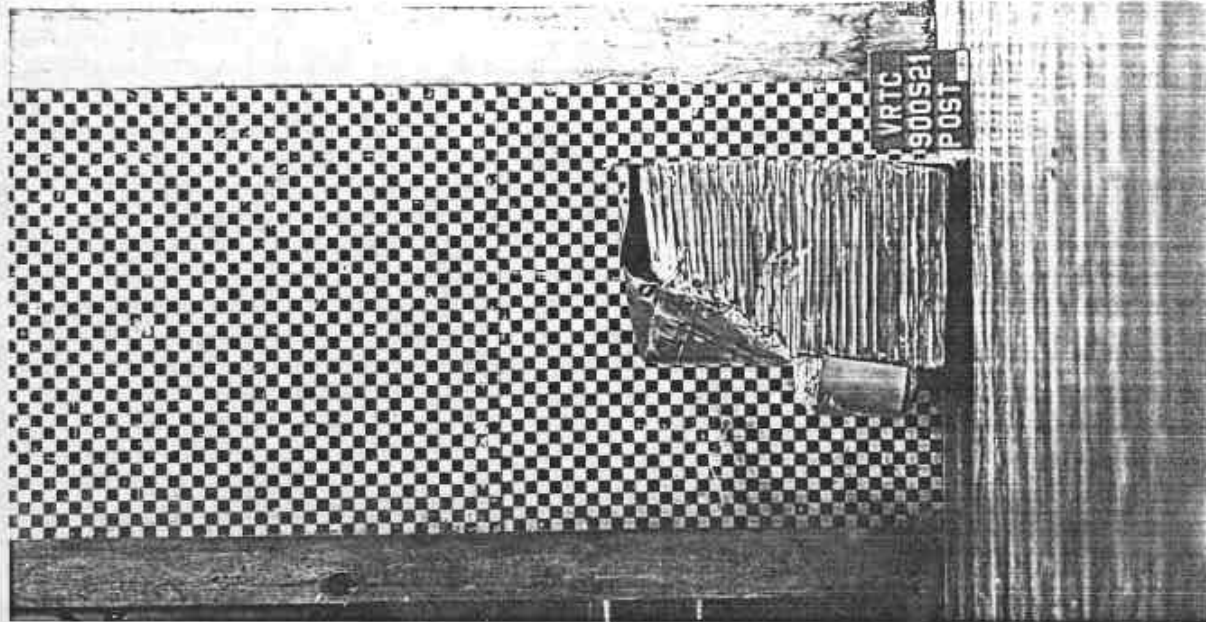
POST-TEST BARRIER FACE - VIEW 1
